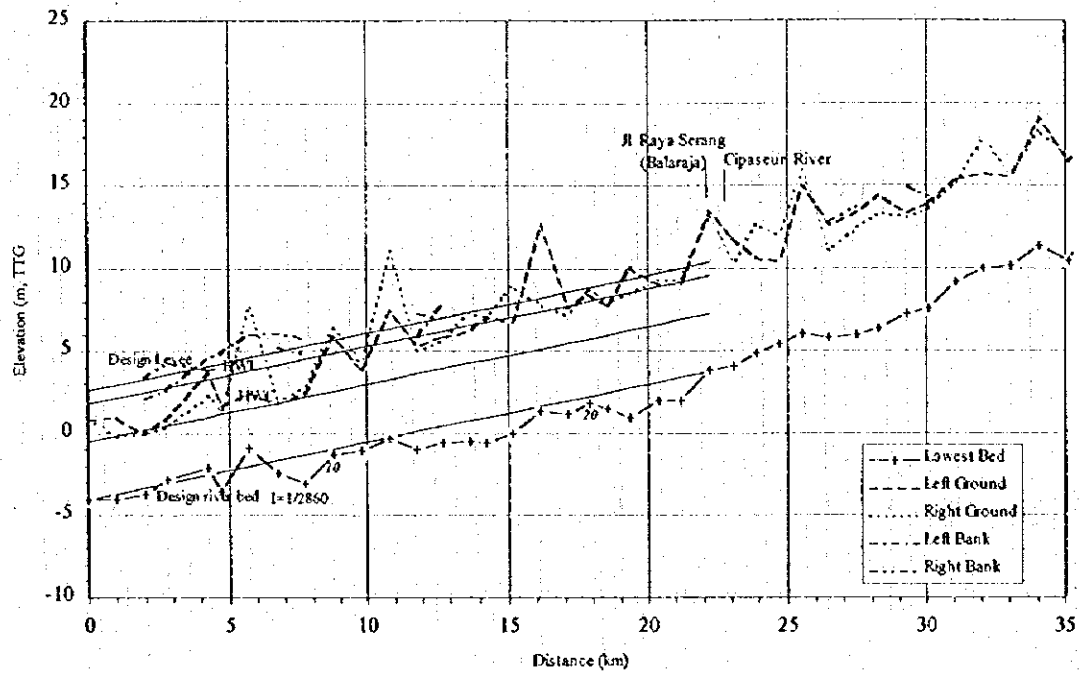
PROPOSED LONGITUDINAL PROFILE AND CROSS SECTION (1/13)
